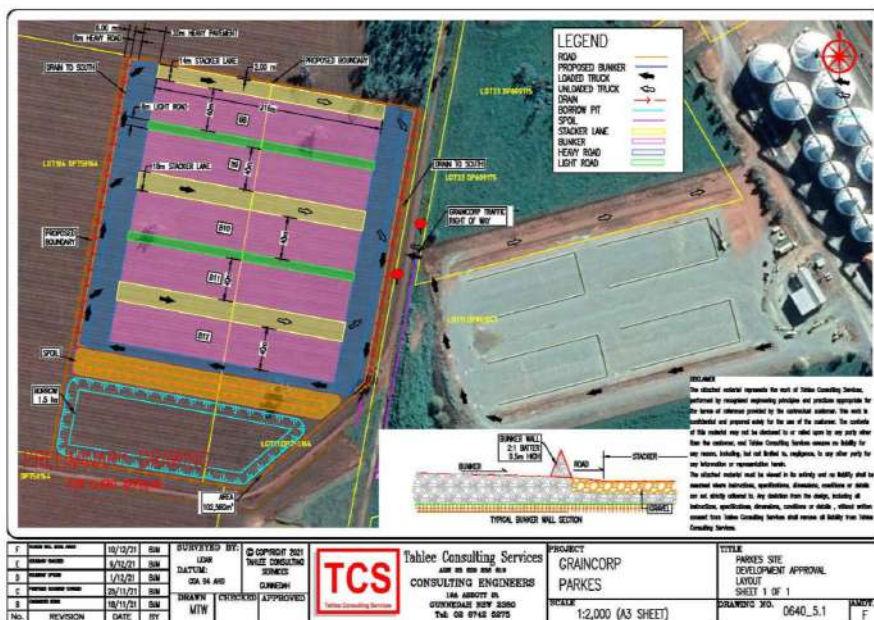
The layout plan for the additional bunkers in the proposed western development area at the Graincorp Parkes site (Tahlee Consulting Services dated 10/12/21).
